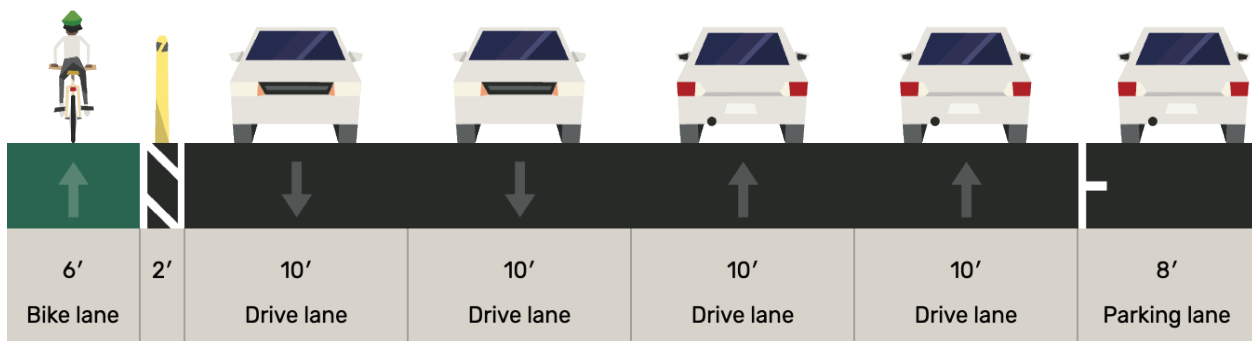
Proposed bicycle facility implementation cross-section at North Crescent Drive from Santa Monica Blvd to Wilshire Blvd
